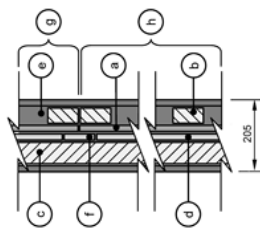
Cross-section through noise barrier (Dimensions in millimetres). a: Fence board; b: Horizontal rail; c: Timber wedge; d: Cover strip; e: Section post; f: Horizontal cover strip at joint between upper and lower panels; g: Upper panel; h: Lower panel
